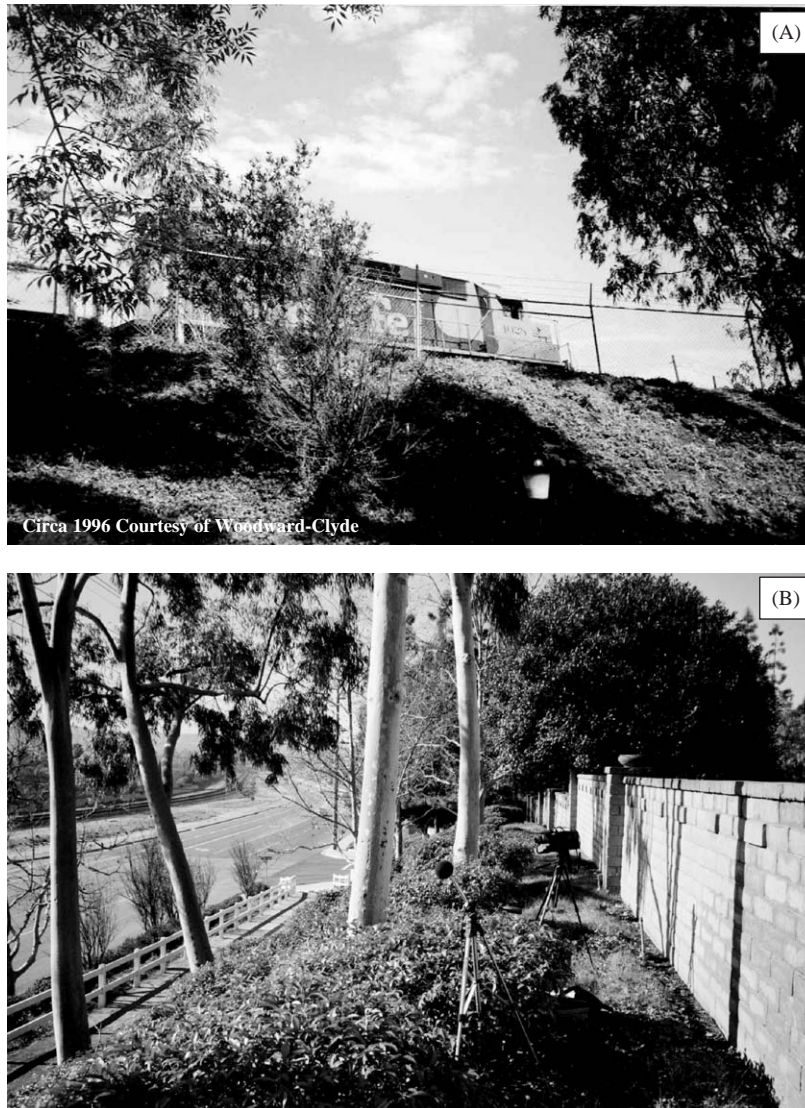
Photographs of soundwall project area. (A) Looking north from yard. Soundwall would shield train in this view. (B) Looking west parallel to rail corridor (and road). Masonry property wall borders properties concerned about reflection from soundwall.
